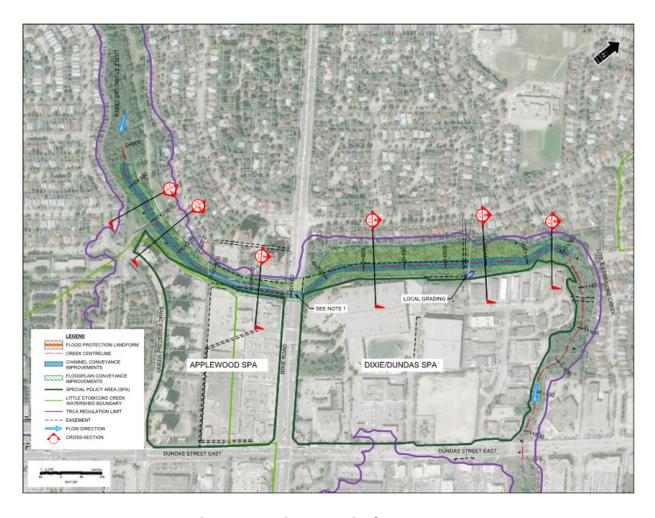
Dixie Area Alternative Solution 2: Planform Concept
